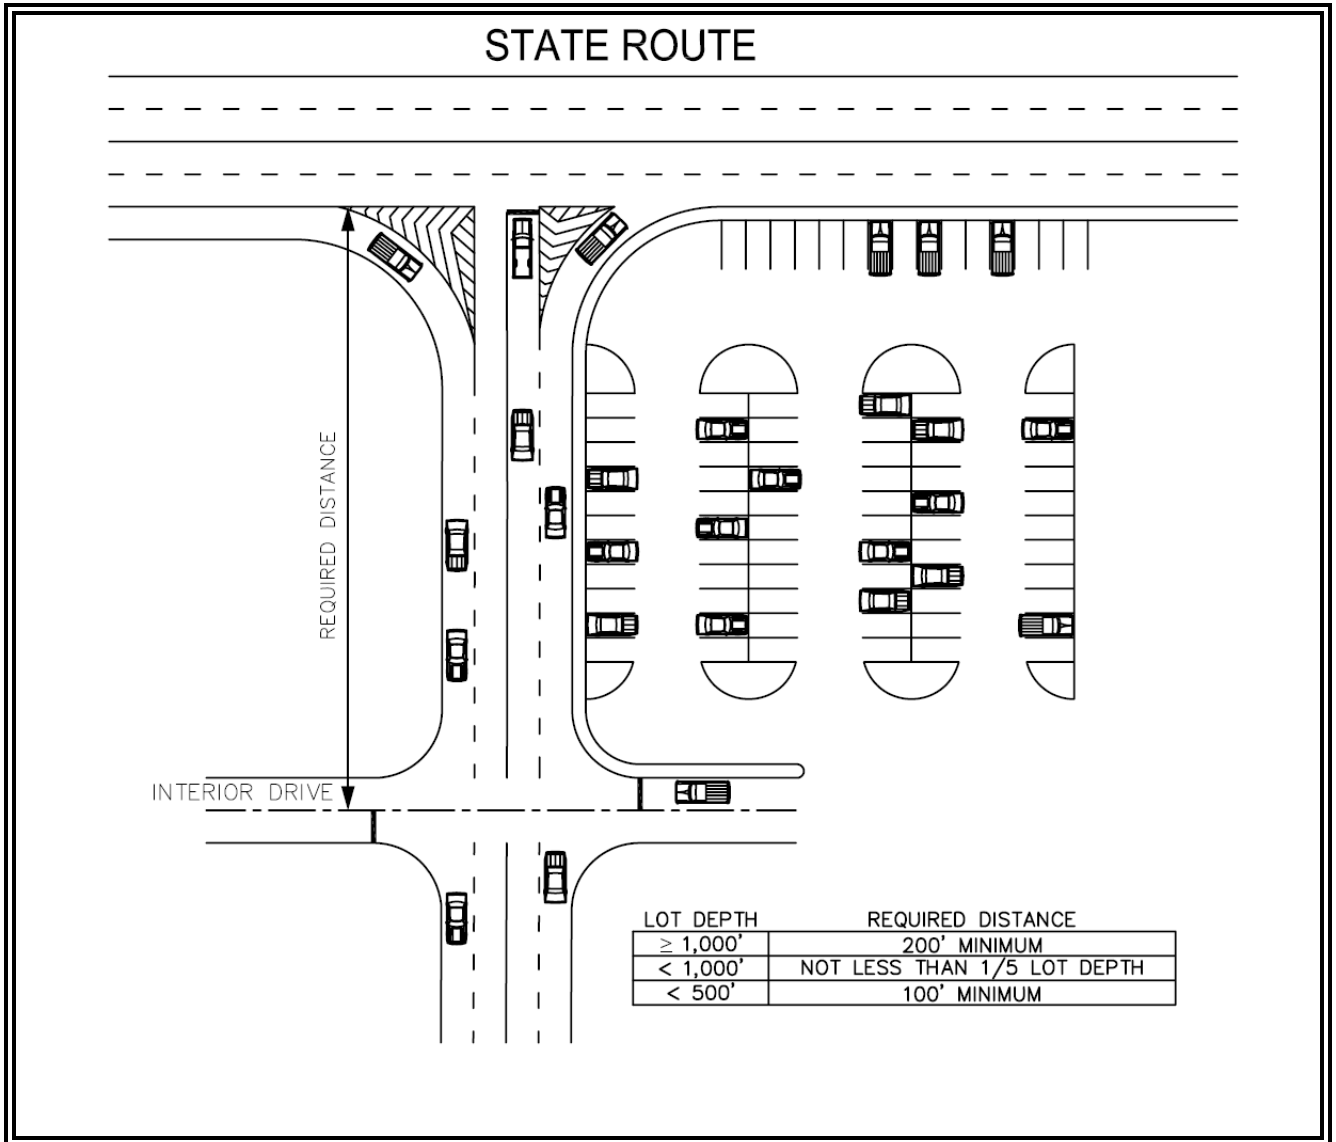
PLACEMENT OF INTERIOR DRIVES
